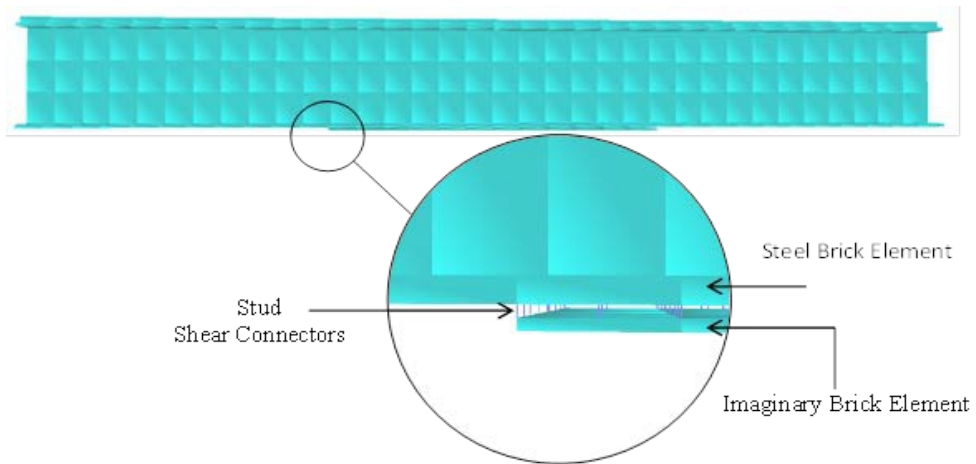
Finite Element Mesh of 544 Brick Elements of Kirk Beam.
